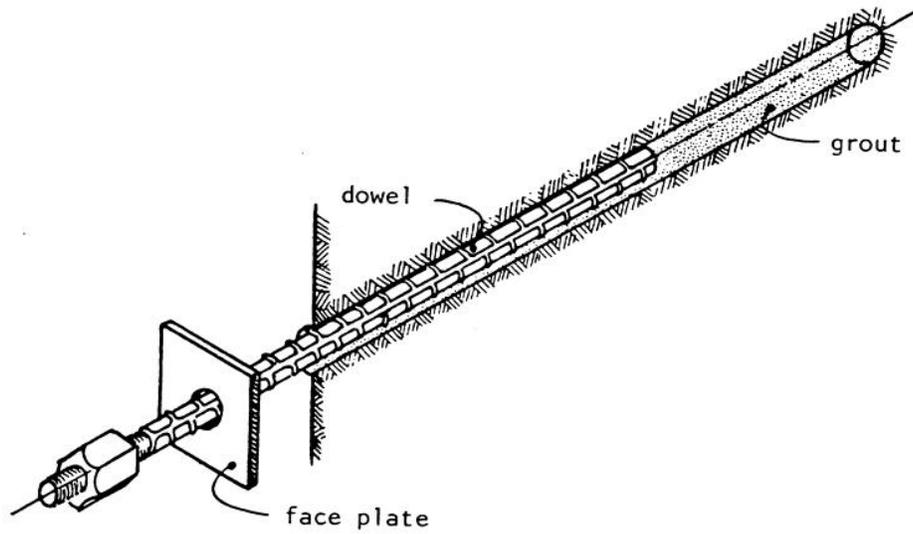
Simple untensioned dowel installed in a grout-filled borehole.
